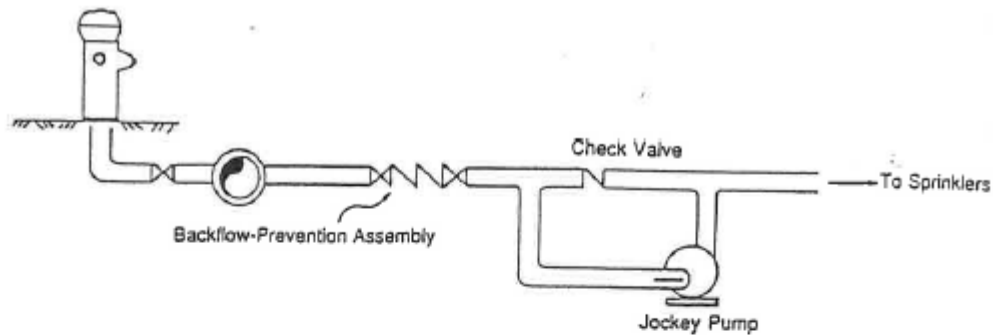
Supply for jockey pump; downstream of backflow-prevention assembly.
